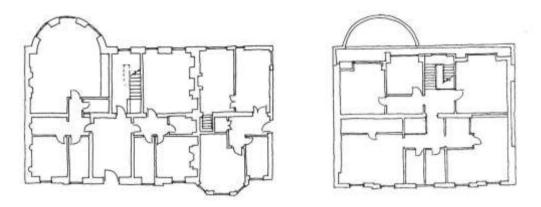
& 34: Ground and second floor plans after the 1960's / 1970's phase of building work
